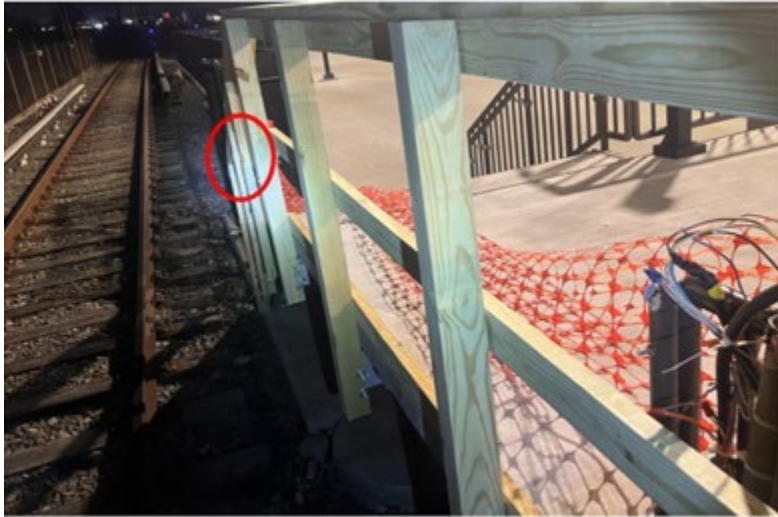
Images of damage to the wooden staircase railing and step bracket on F617.
